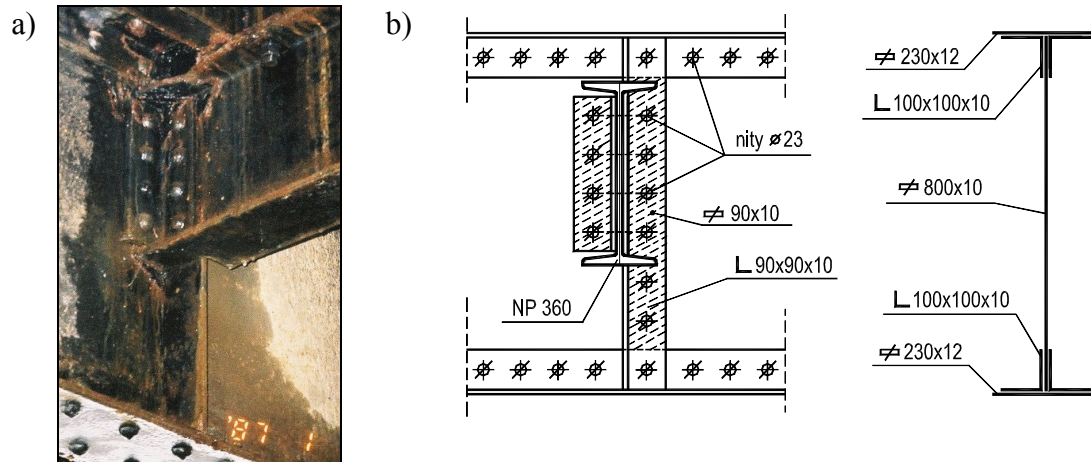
Analyzed connection: a) general view, b) initial layout and crossbeam cross-section
